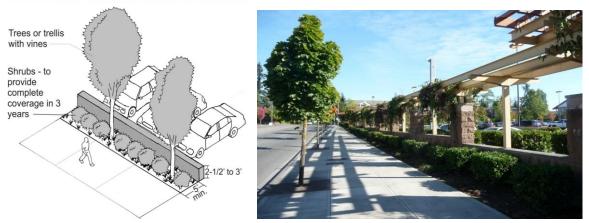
B.12: Parking area planting buffer with low wall and landscaping. Illustration with trees (left) and example with trellis (right).
